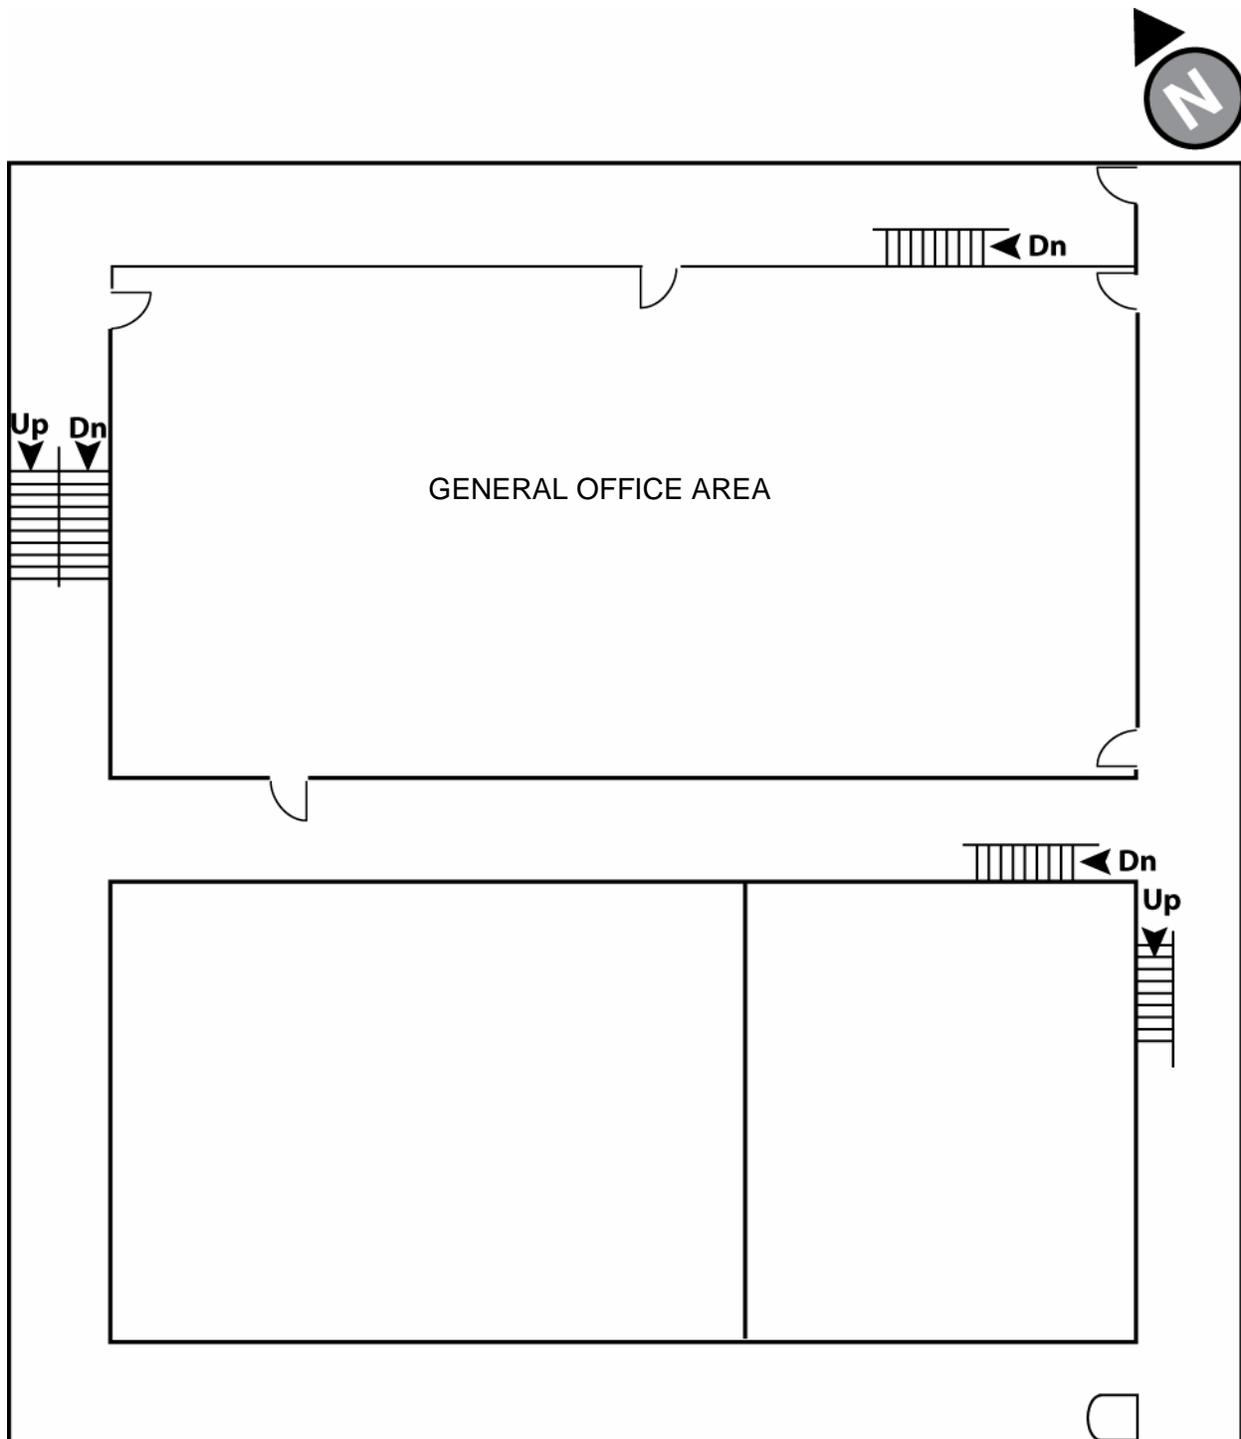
Floor Plan for Building 9825H, Special Projects Building, 2nd Floor
